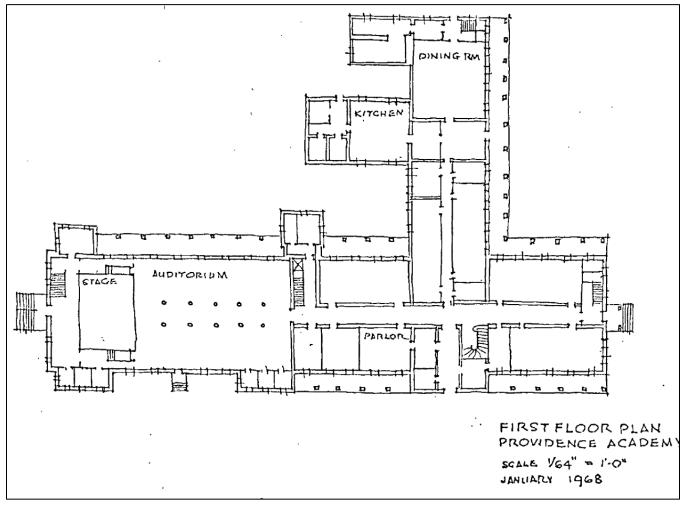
<u>House of Providence first floor plan in 1968 (Lentz, "House of Providence, Vancouver, Washington," Supplemental materials).</u>
